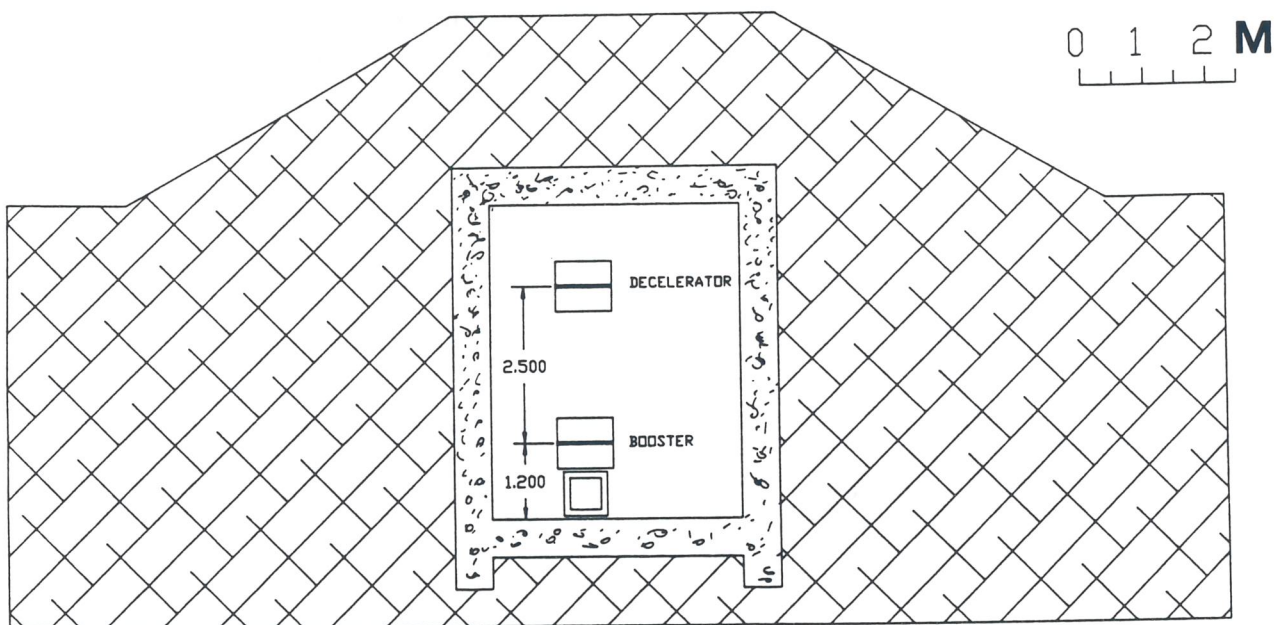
Tunnel Cross-section and Arrangement of the Rings
